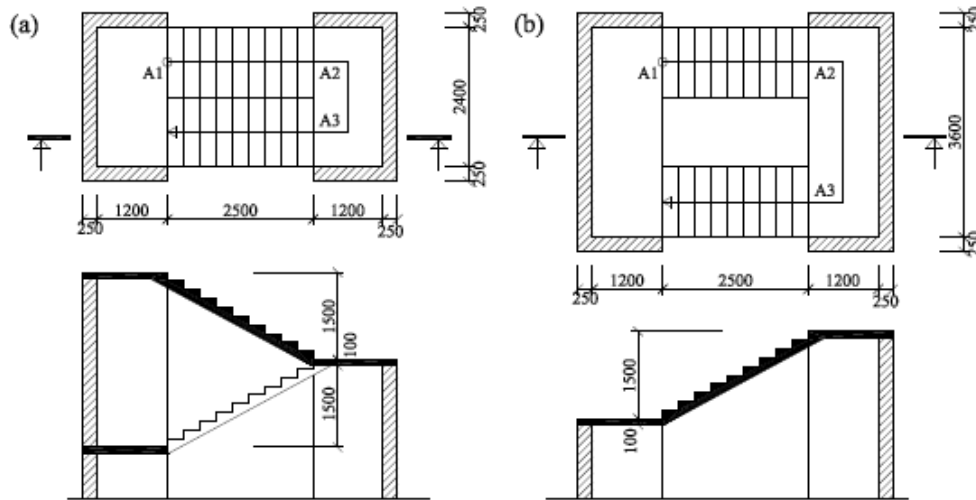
Typical Dimension of Dog-Legged Stair (a), Open-Well Stair (b)
